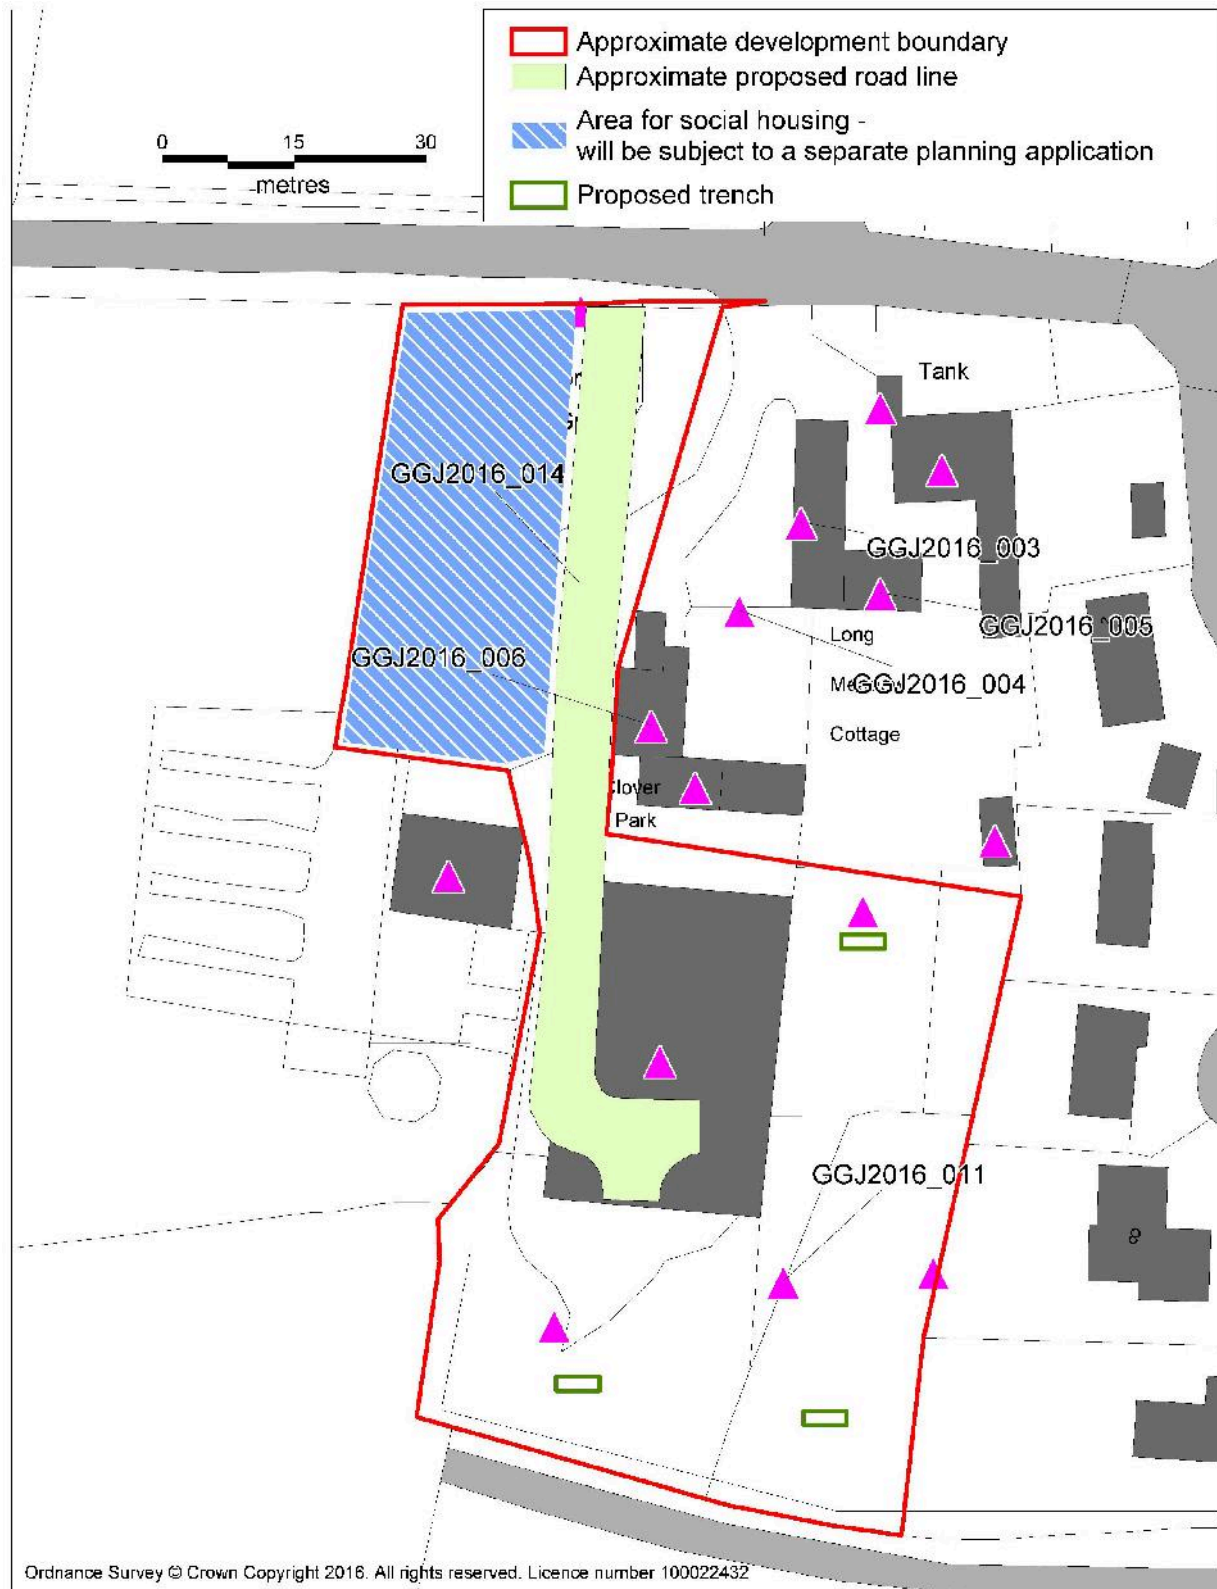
Location of the proposed access road and of the proposed watching brief (shaded in green) and the three 5 metre x 1.7 metre trenches..
